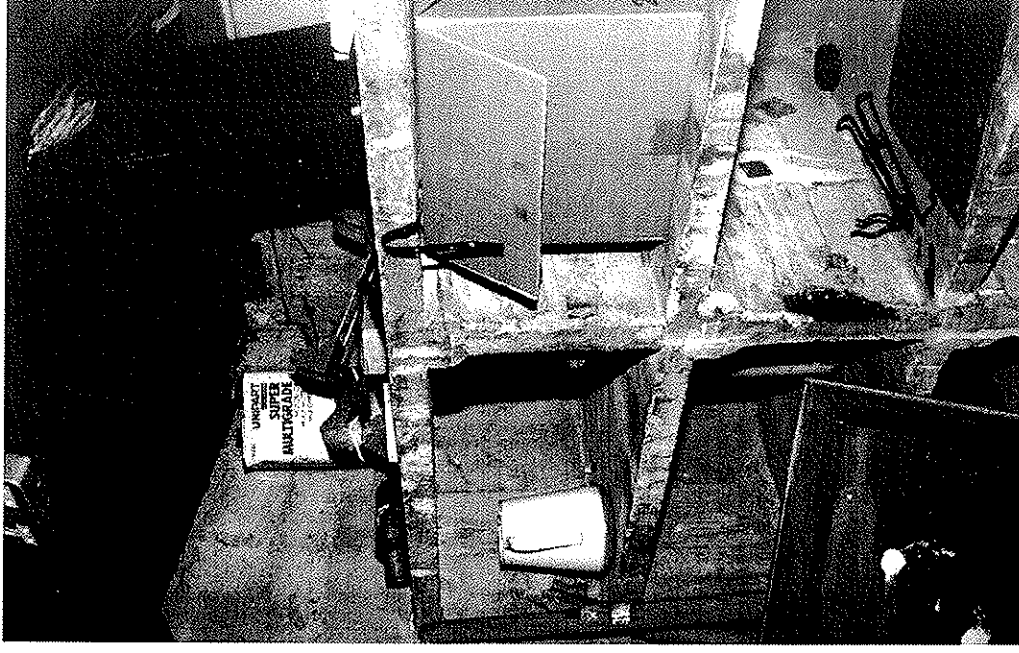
Interior detail of the flat roofed store showing cast *in-situ* concrete shelves.
